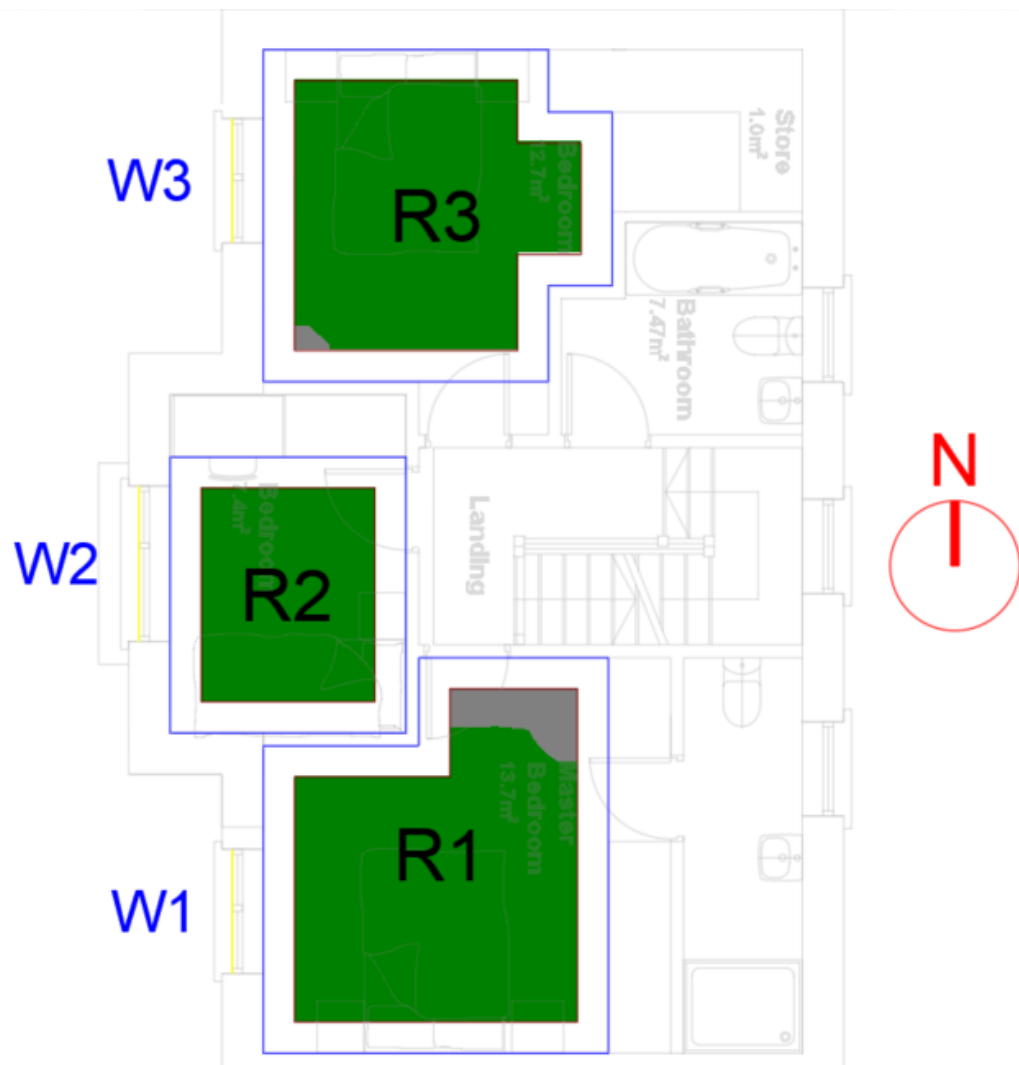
Proposed First Floor sDA Contours of House F-02 2-035
